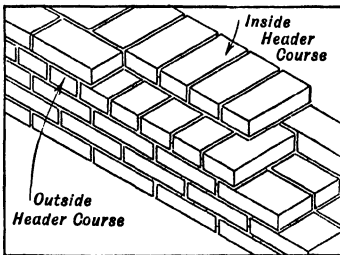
Method of lapping inside and outside header courses in 12" solid brick walls, common bond.
